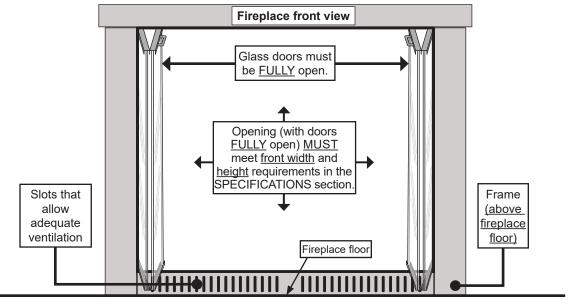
Correct glass-doors frame setup, ventilation, and use (if applicable)
